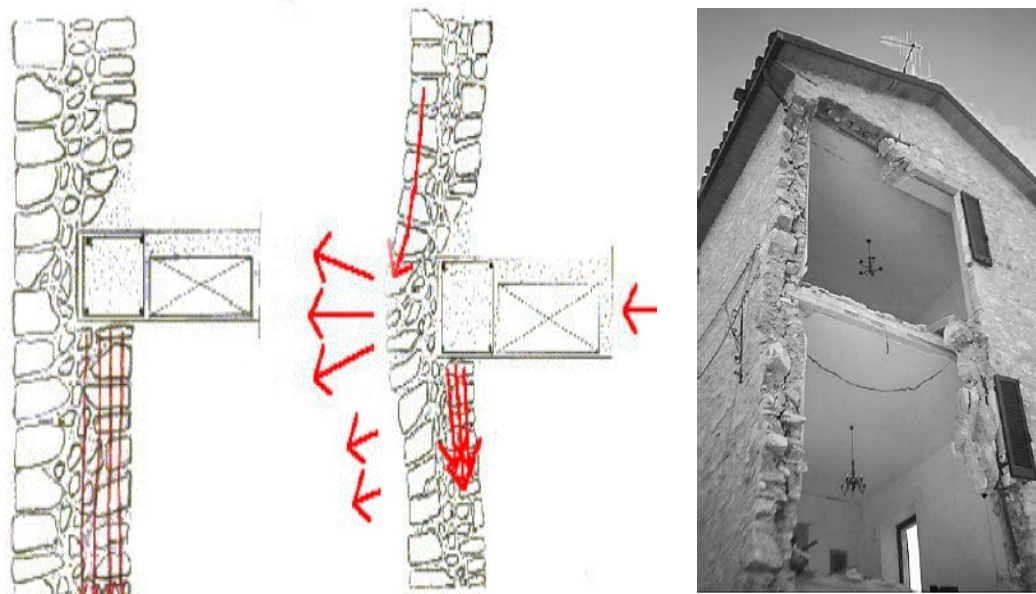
The removal of timber-beam floors and the subsequent reconstruction with concrete (left), damages due to the replacement of timber floors (right) [40]
